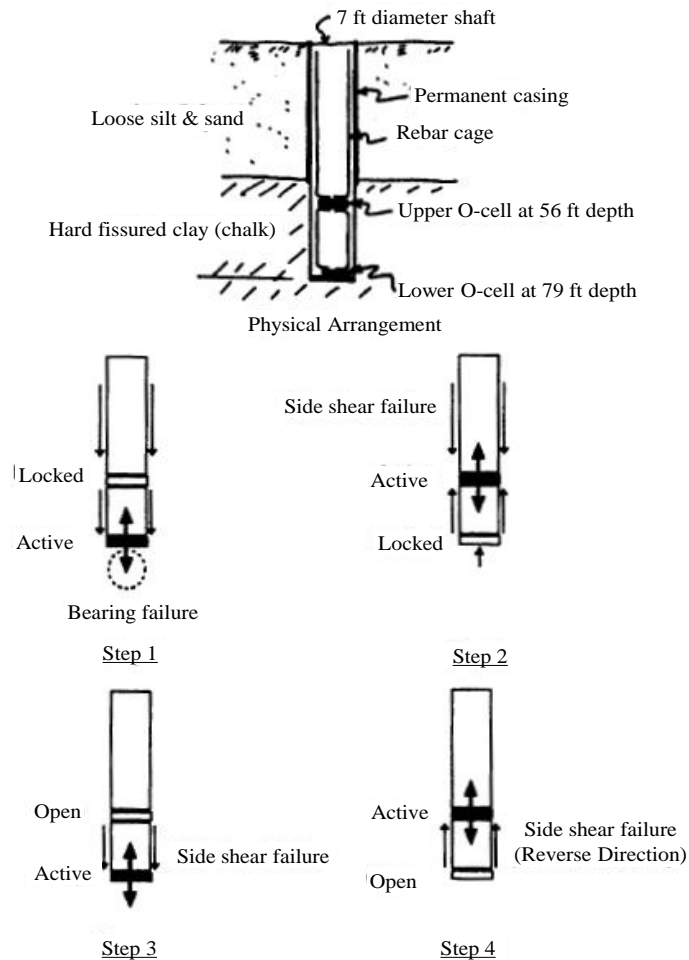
Multi-level O-cell testing arrangement (O'Neill et al. 1996)
